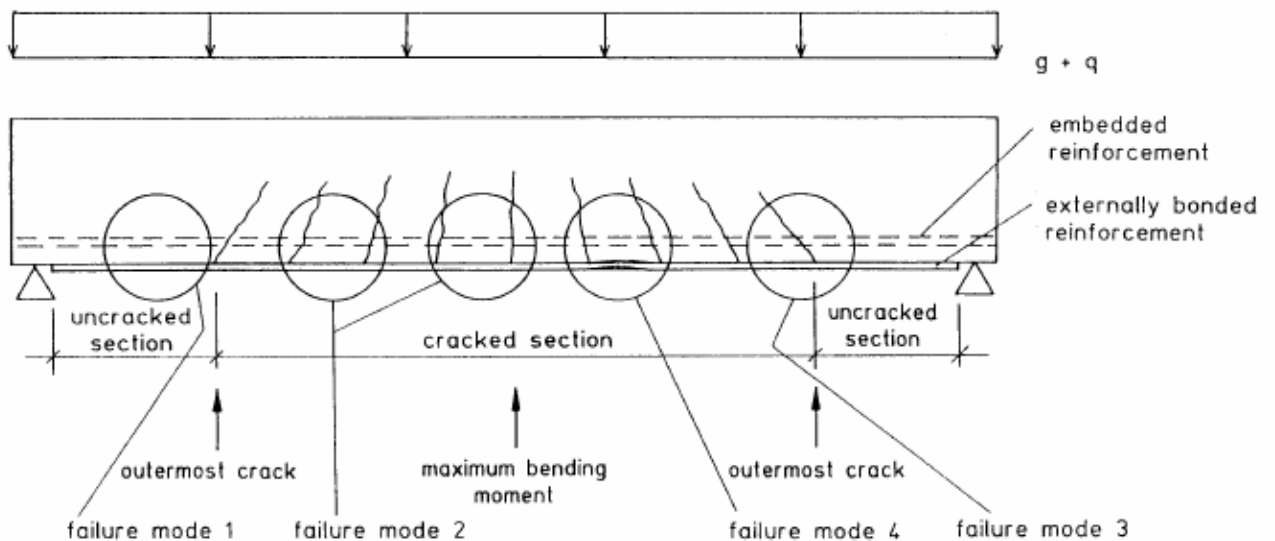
Bond failure modes of a concrete member with EBR
